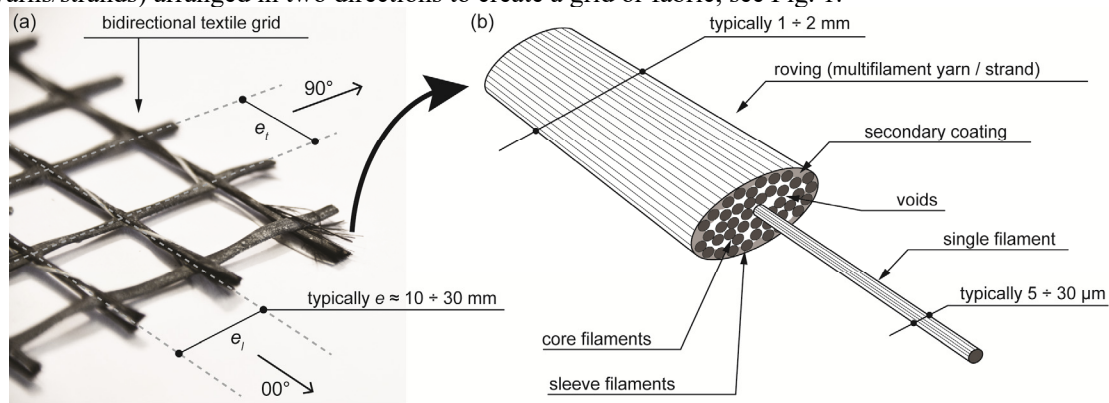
Fabric reinforcement: a) textile structure, b) structure of the multifilament yarn.
